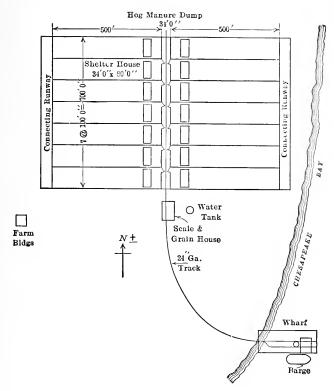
General Plan of Hog Farm, Baltimore, Md.
